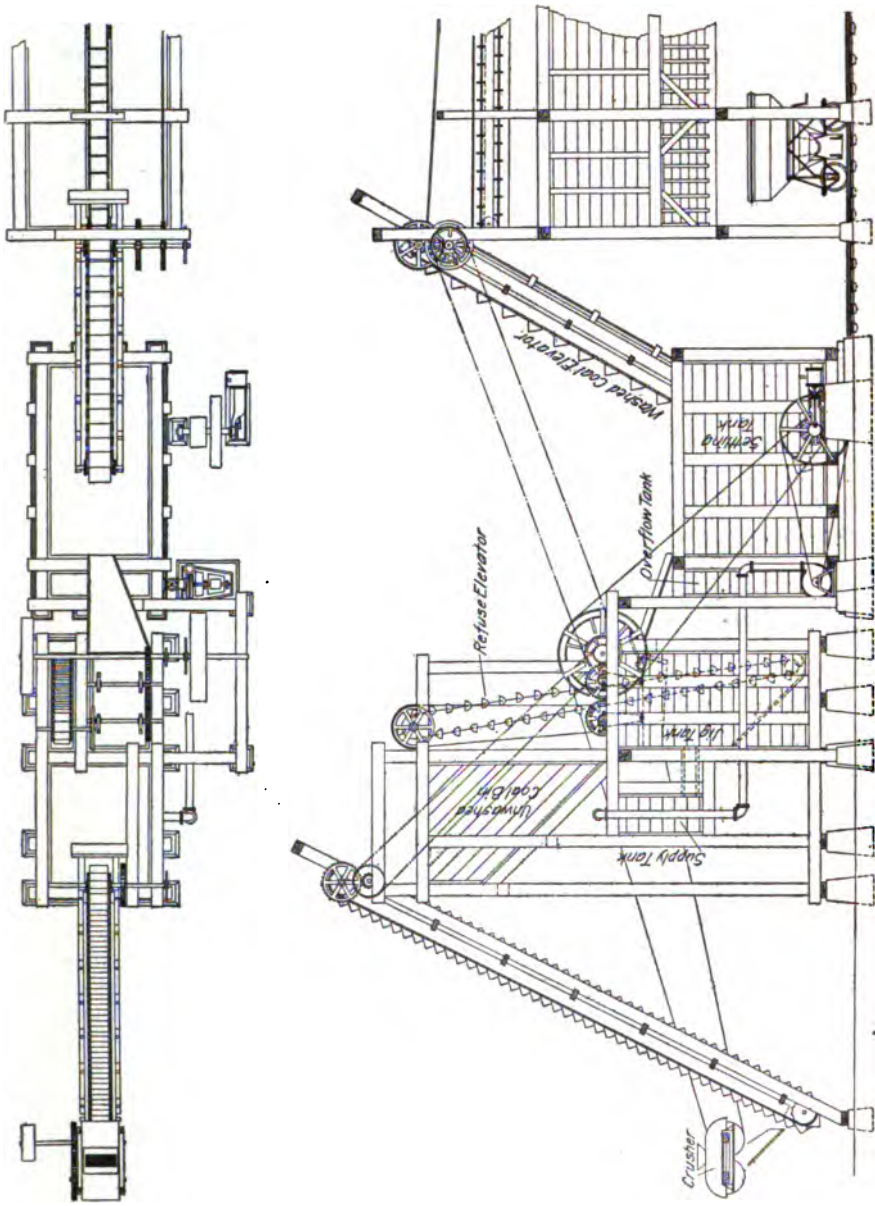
SECTION AND PLAN OF STEWART WASHERY
